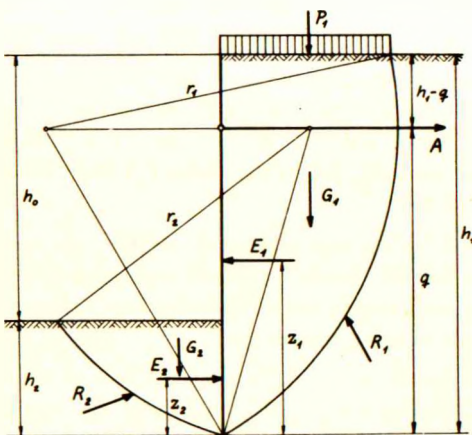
A: Forces acting upon anchored sheet wall and adjacent earth wedges.
